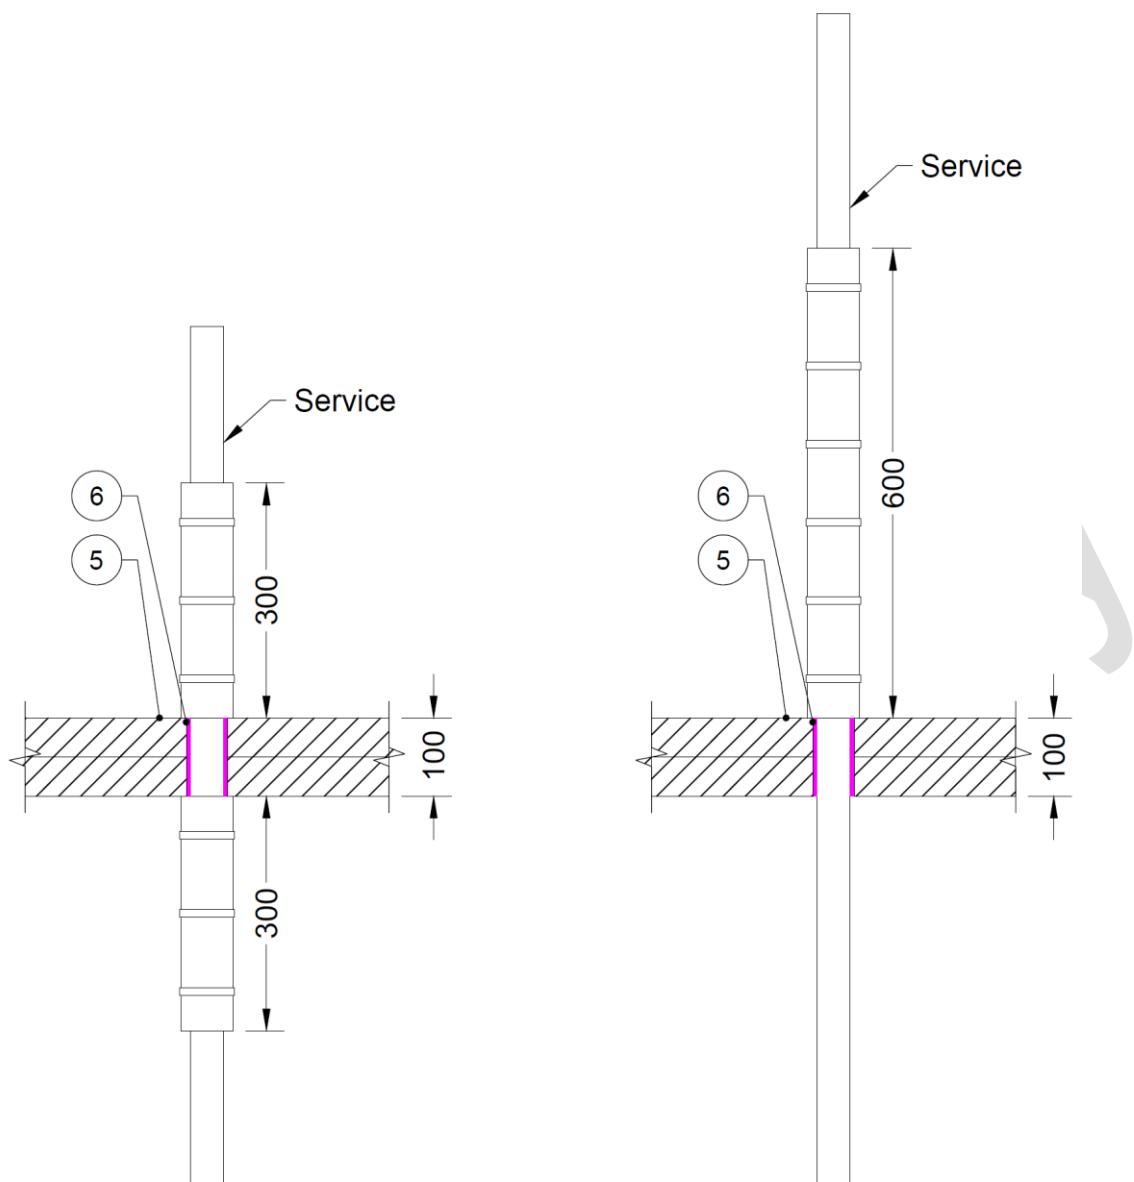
Section View of Steel Pipes (up to Ø41mm) Installed in Horizontal Substrates
